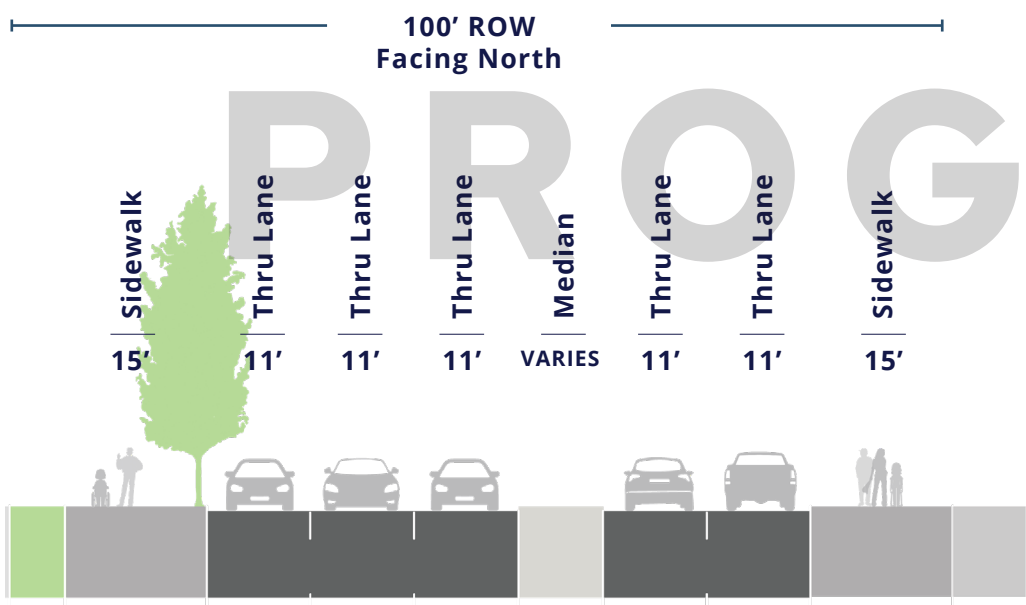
| Typical cross-section through Summit Ave in Segment G
